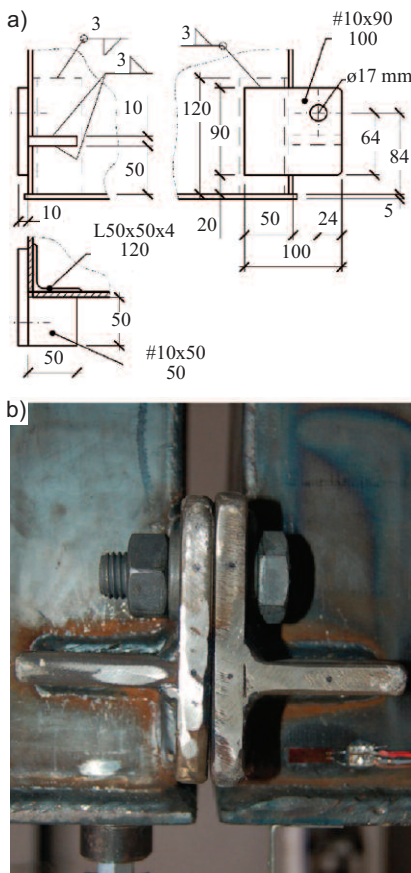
Details of connection in bottom corner of the pontoon: a) structure; b) view
